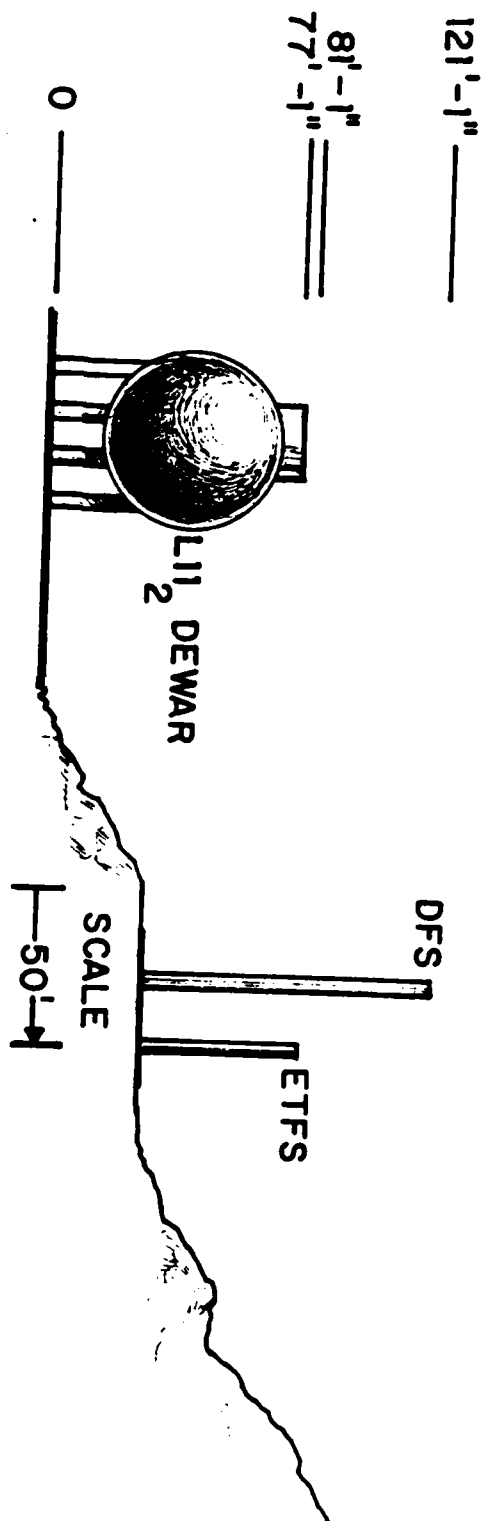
Horizontal view of the flare stack site, showing elevation of the stacks, hydrogen storage dewar, and terrain.
